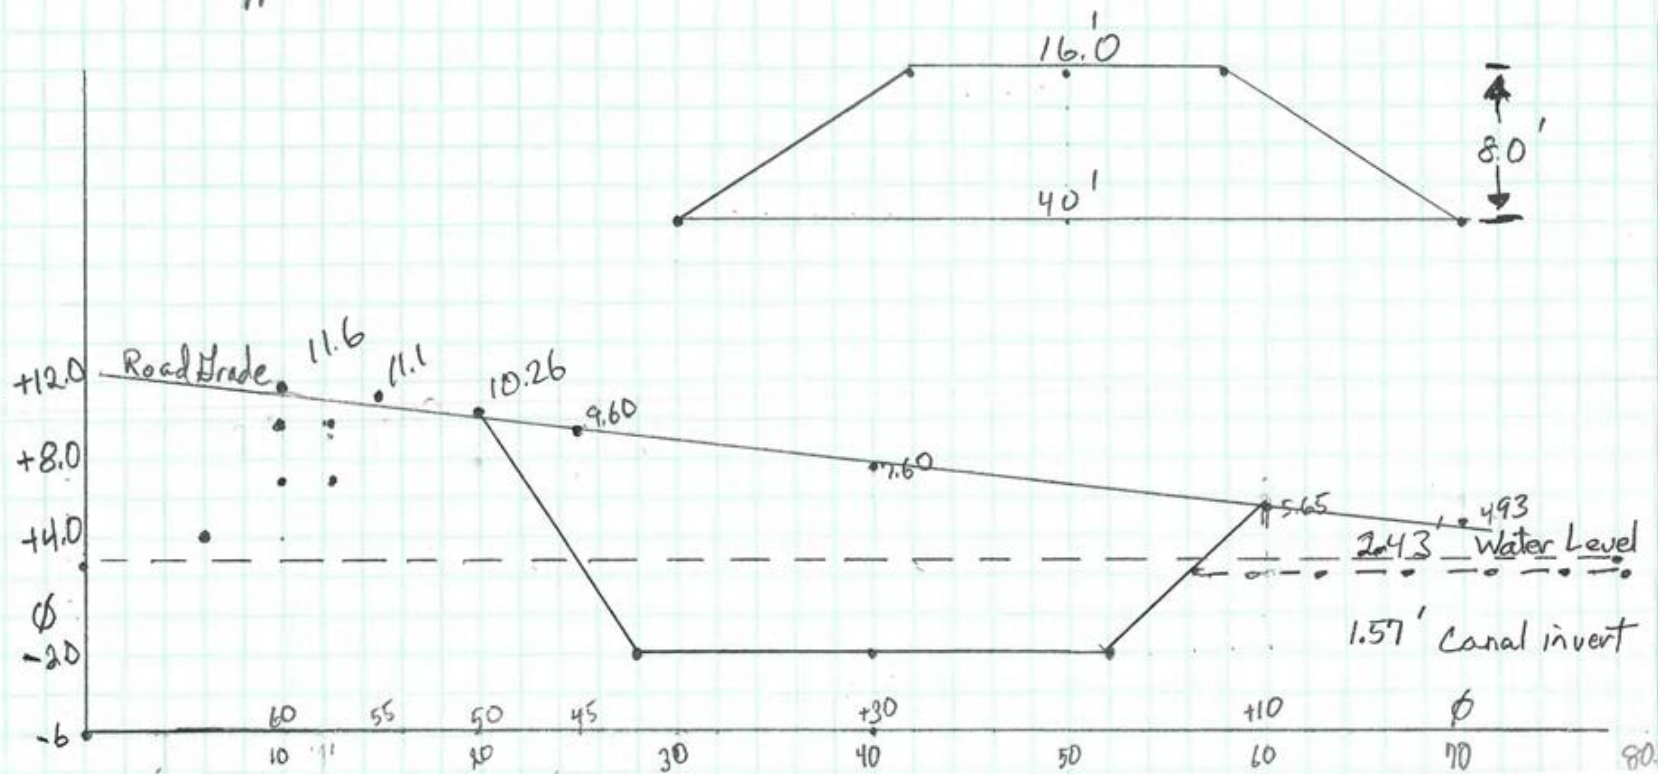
Unit 1 S. Canal S.E. pasture access bridge cross-section drawing profile of canal excavation and road profile.
